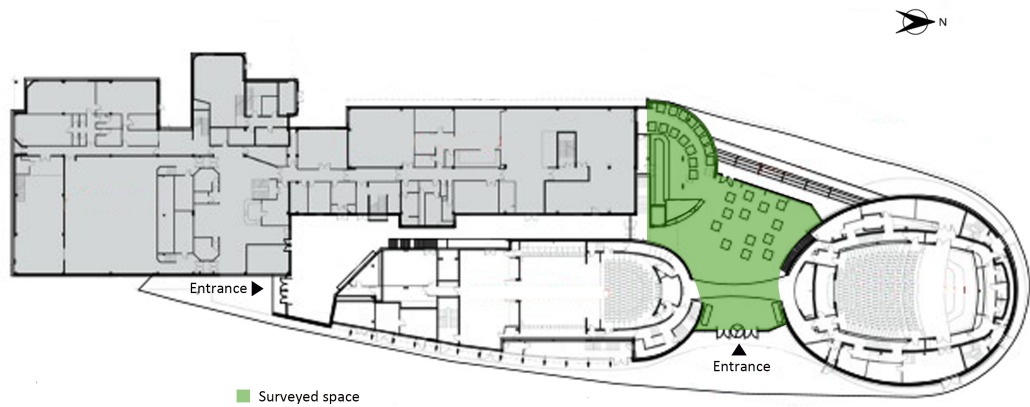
Floor plan of the case study building RWCMD's surveyed indoor transitional space.
